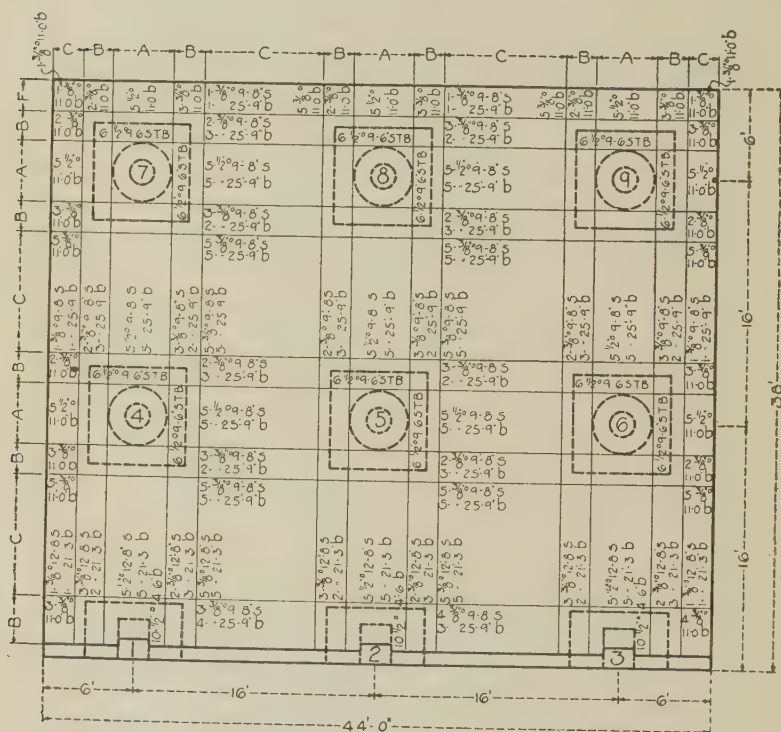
REINFORCING PLAN FOR SLAB J.
